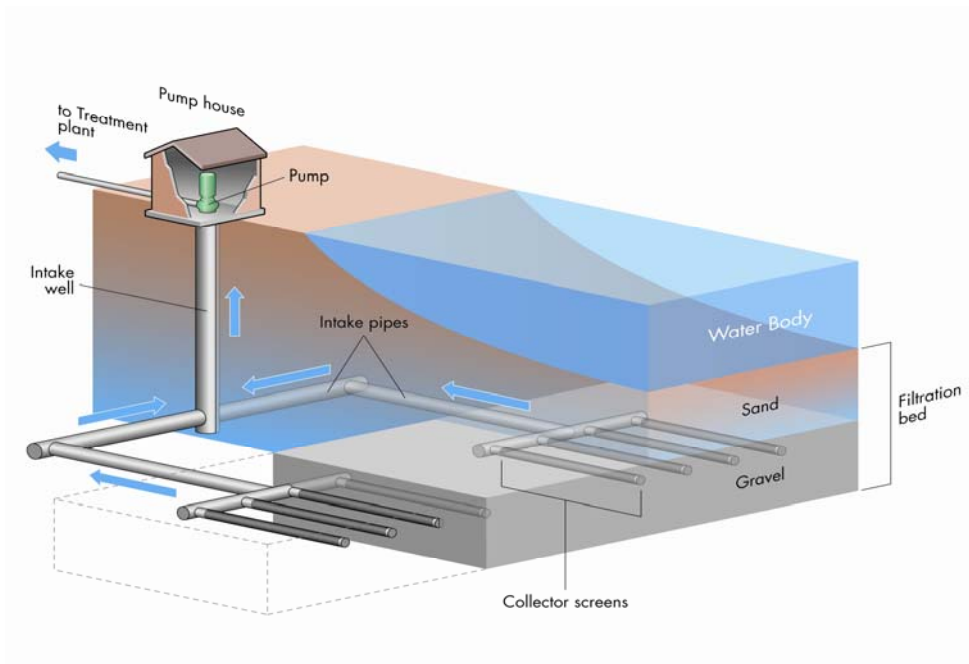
Subsurface Infiltration Gallery (Fukuoka Type Intake)
